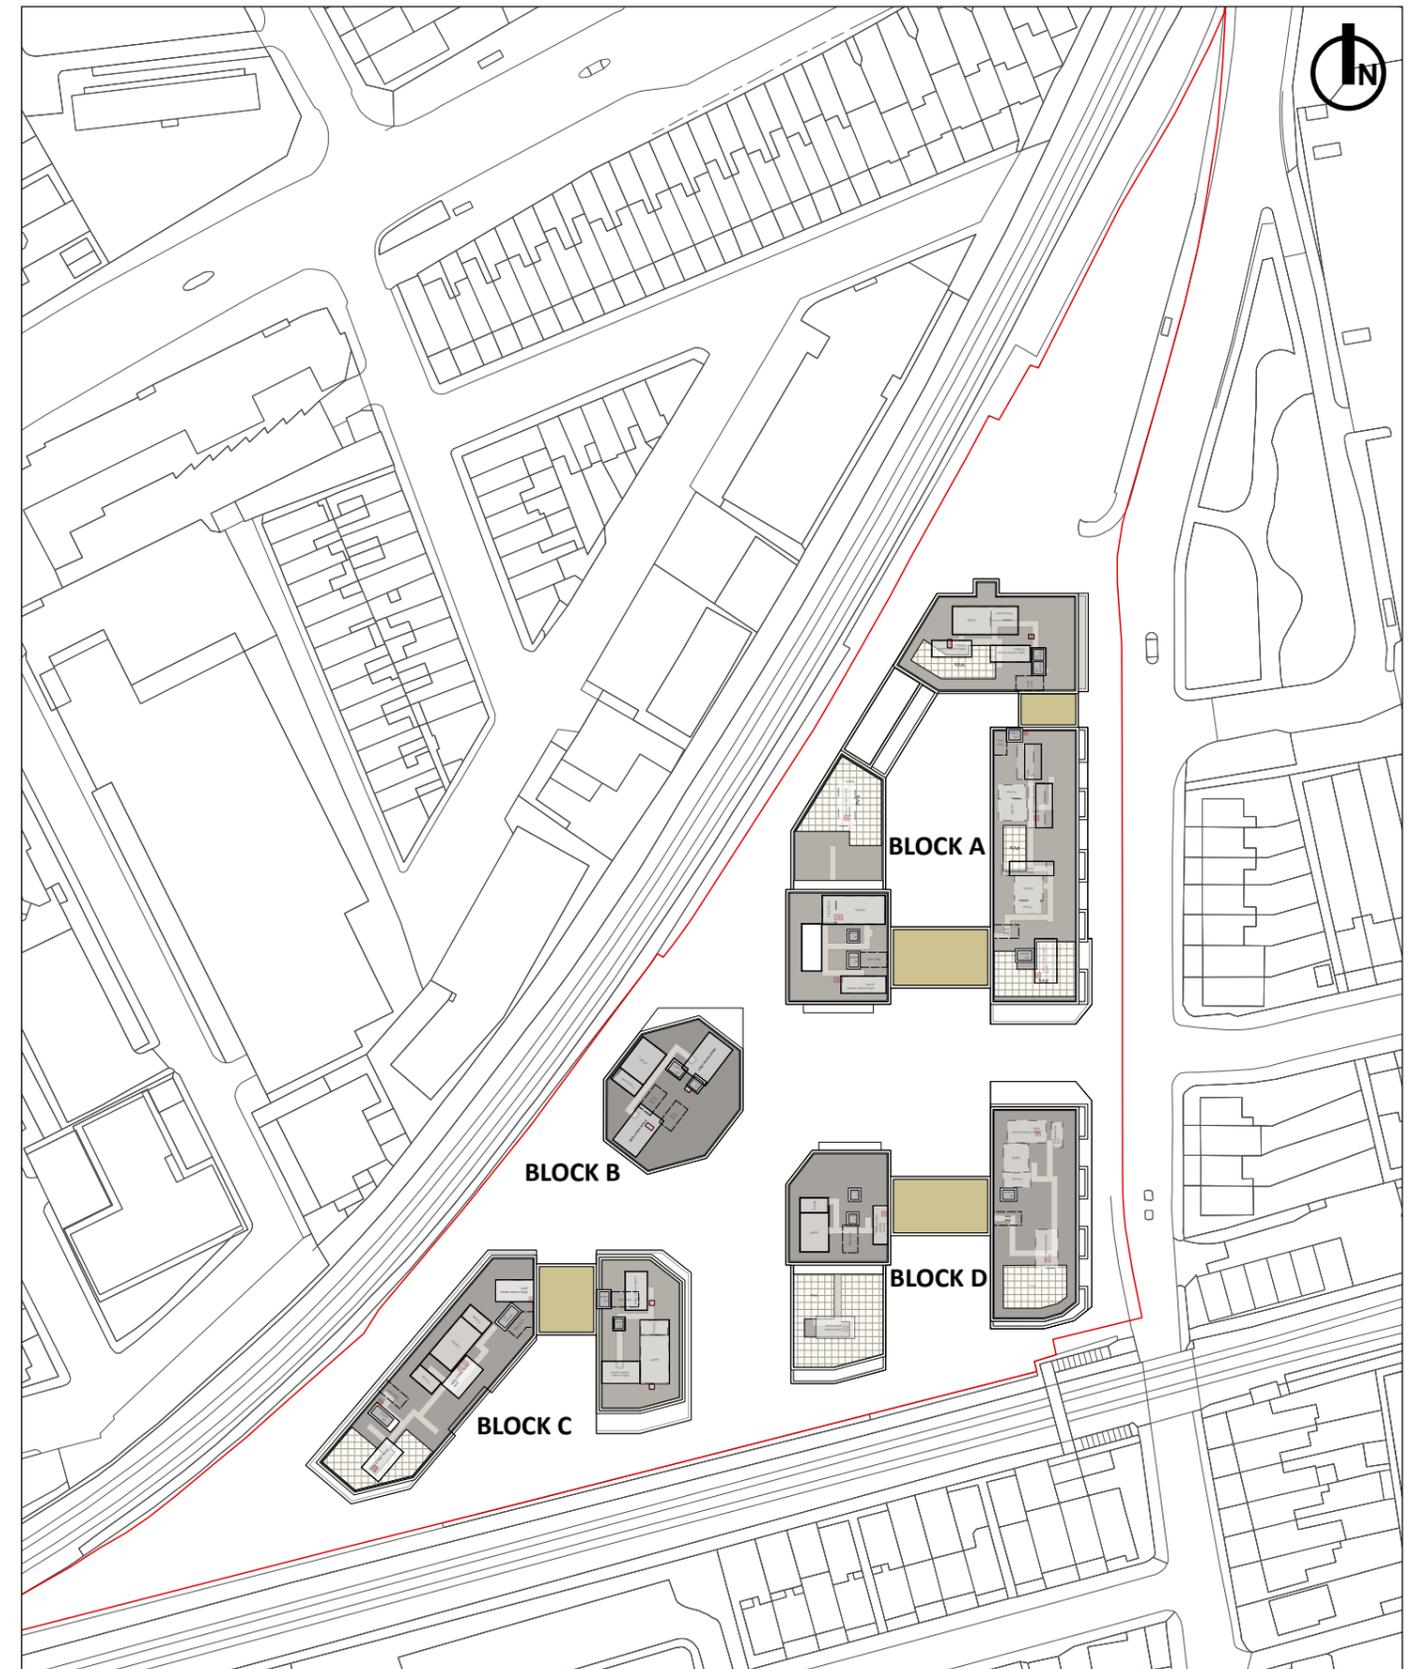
Block plan (Showing roof plant) Assael Architecture
